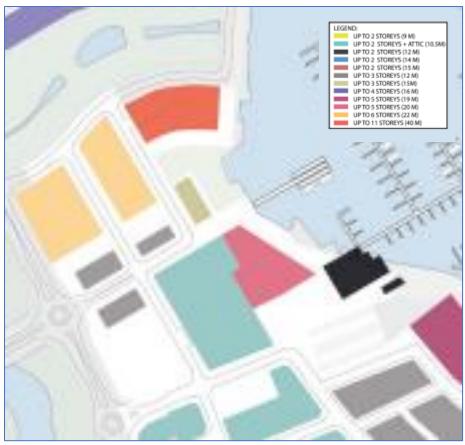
Extract of Height Plan from Section 75W modification revised Concept Plan design report response to submissions dated July 2018
